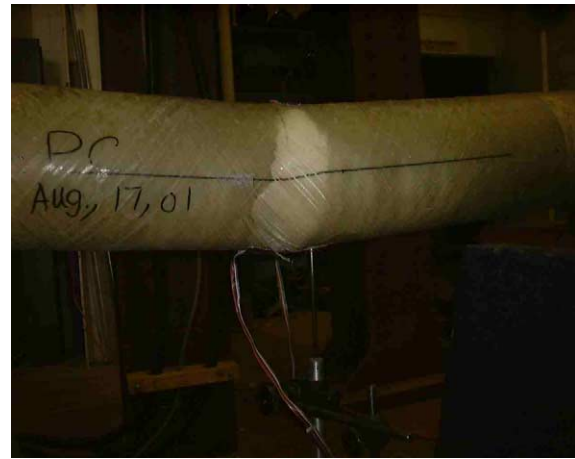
Typical failure mode of concrete-filled GFRP tube under transverse load.
